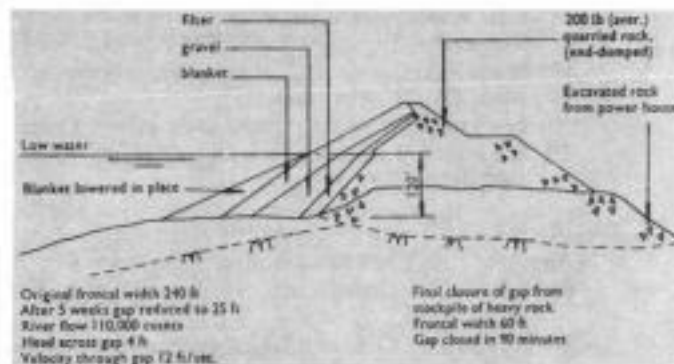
Cross-section of Dalles Dam, Columbia River, USA (Mackintosh²¹)
